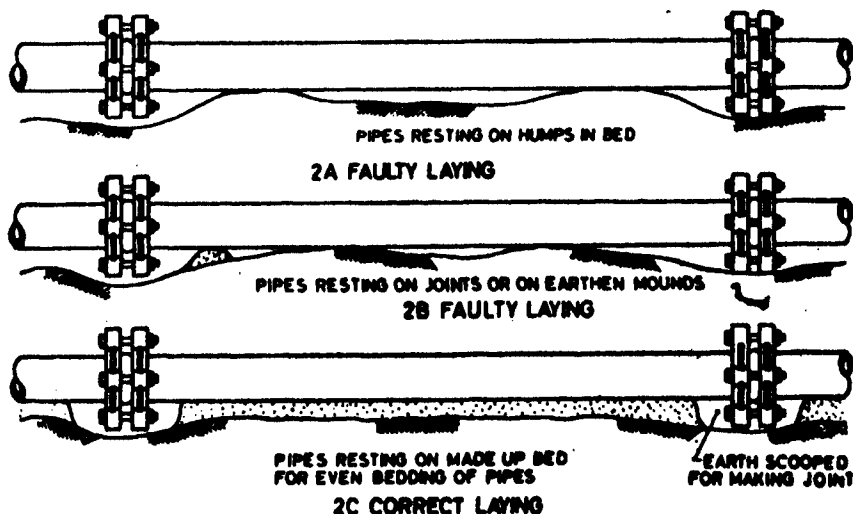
LAYING OF ASBESTOS CEMENT PRESSURE PIPES IN TRENCHES
